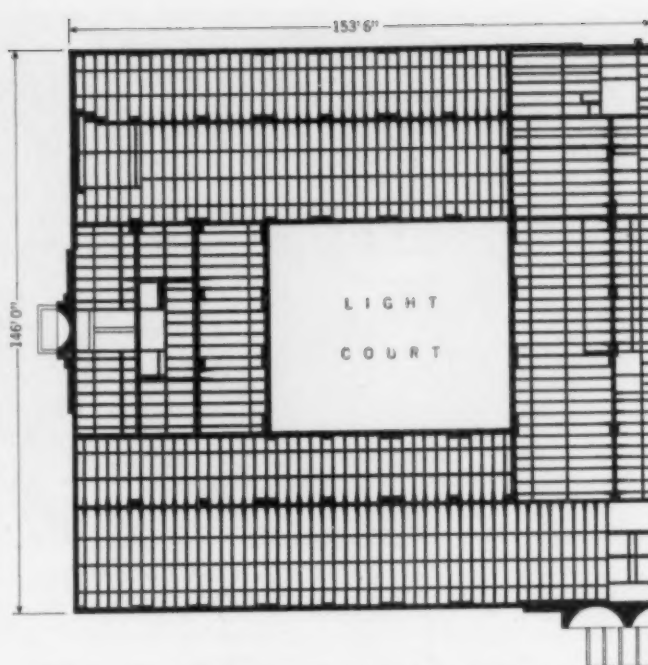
TYPICAL FRAMING PLAN—HALF OF SECOND FLOOR
